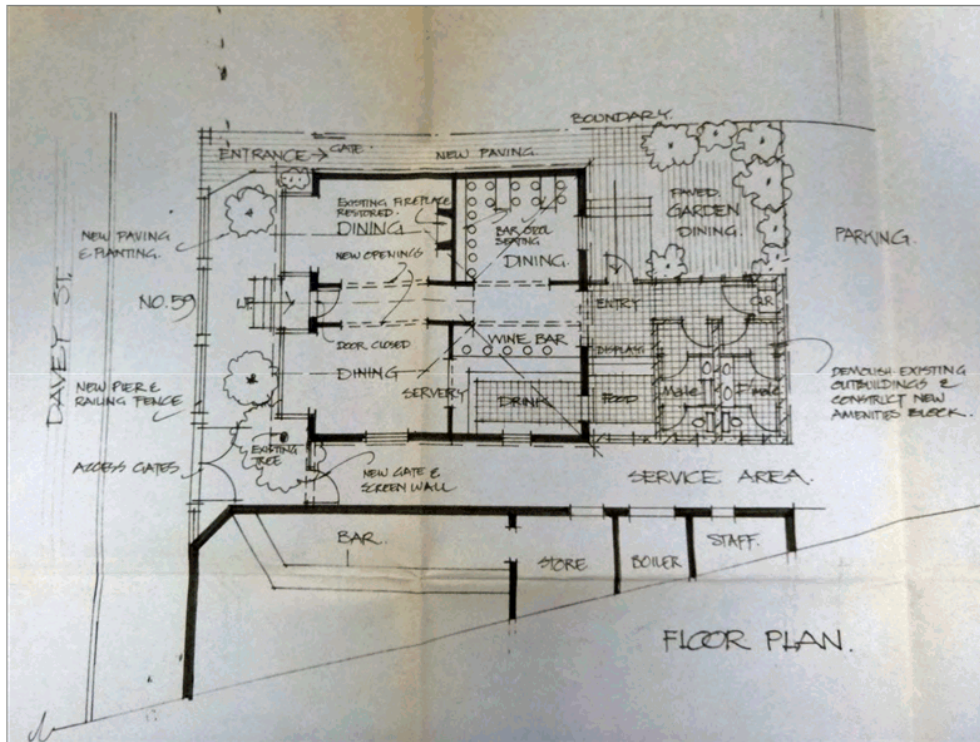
Detail from 1989 building application plan showing proposed internal modifications, and replacement of the rear outbuildings. These works do not appear to have been carried out (TAHO, AE417/10/3150, 59 Davey Street, Change of Use & Alterations (891002), 1989).
